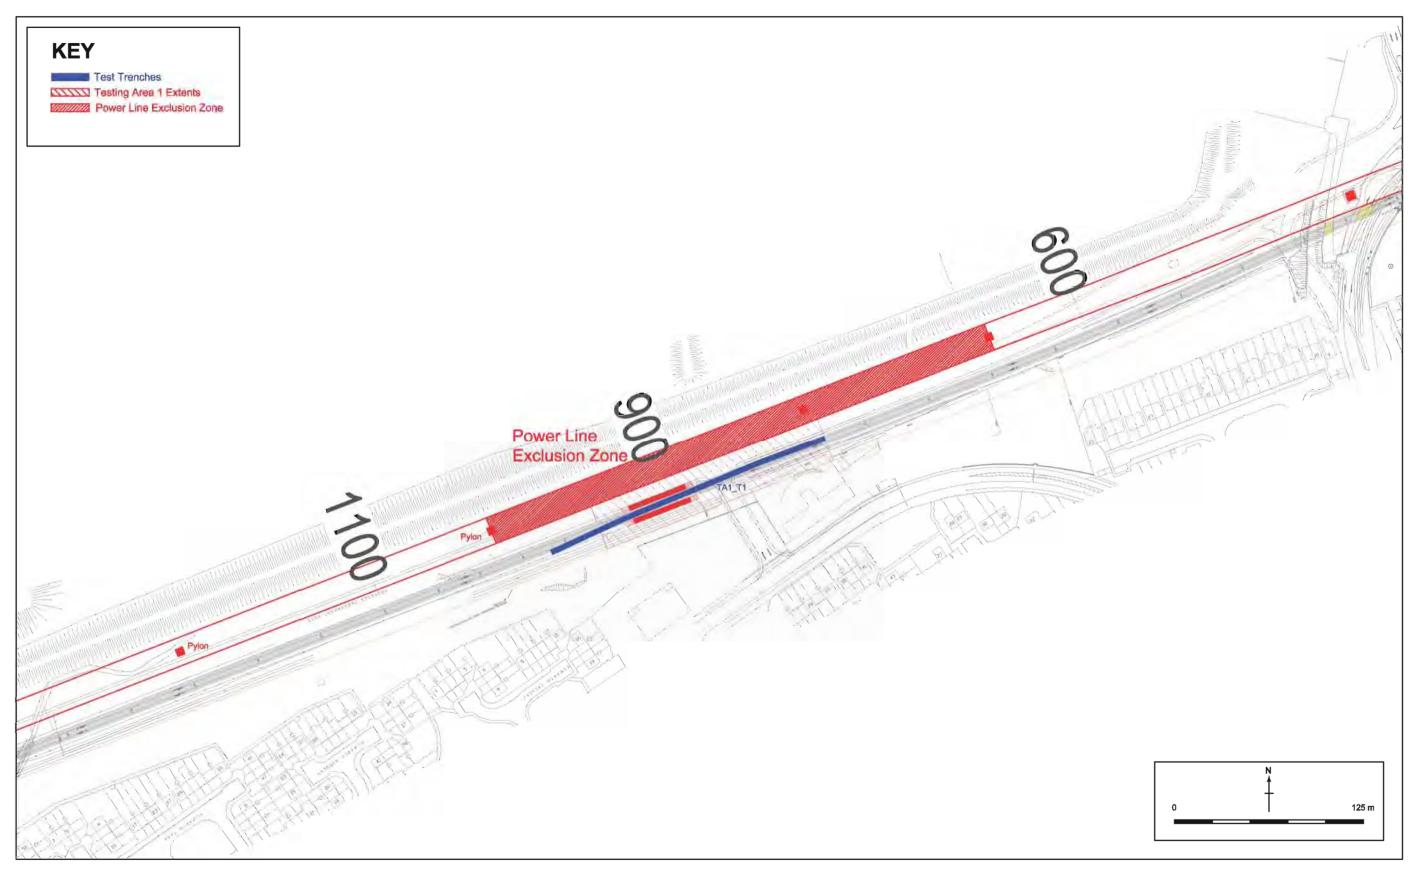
Luas Line A1 Centreline Testing, Testing Area 1 Trench Layout, Fettercairn Stop.
